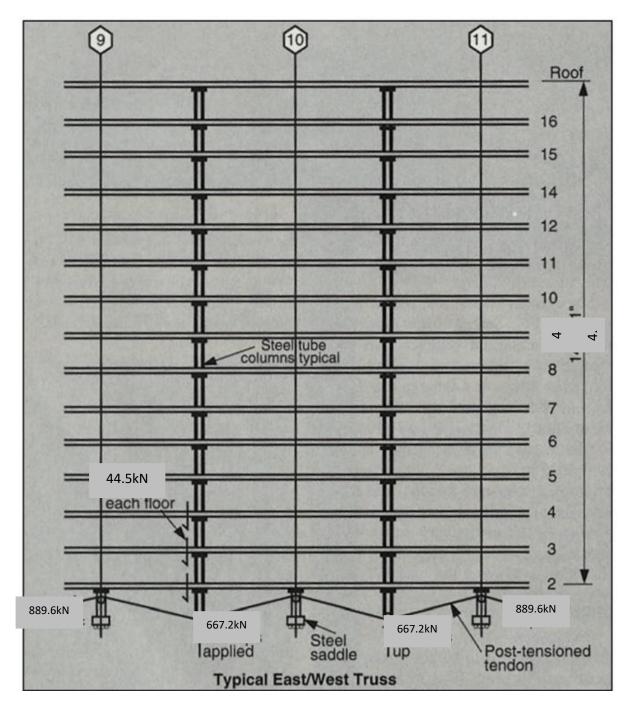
Section 1 of Figure 2.16, showing east/west truss. The system of post tensioning method is placed in between the second-floor slab and the first-floor false ceiling
